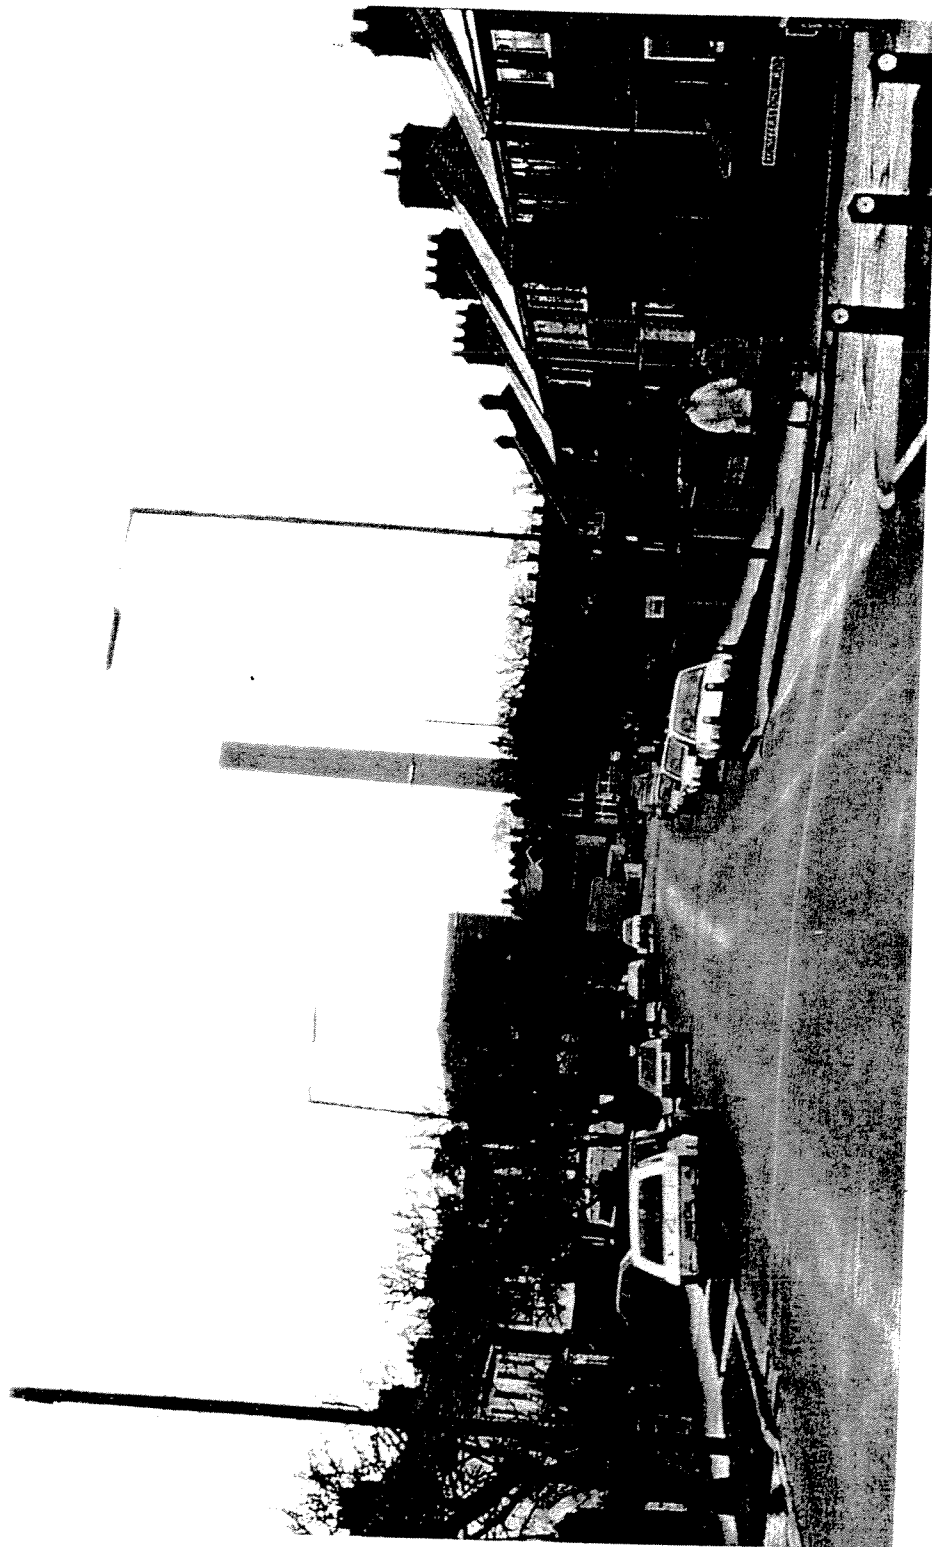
EXISTING VIEW FROM BURGH ROAD
